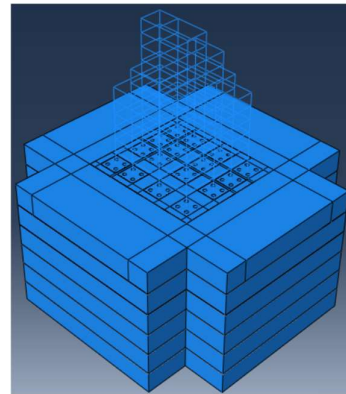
Isometric view of the model used for building with vertical irregularity on plane ground with pile foundation
